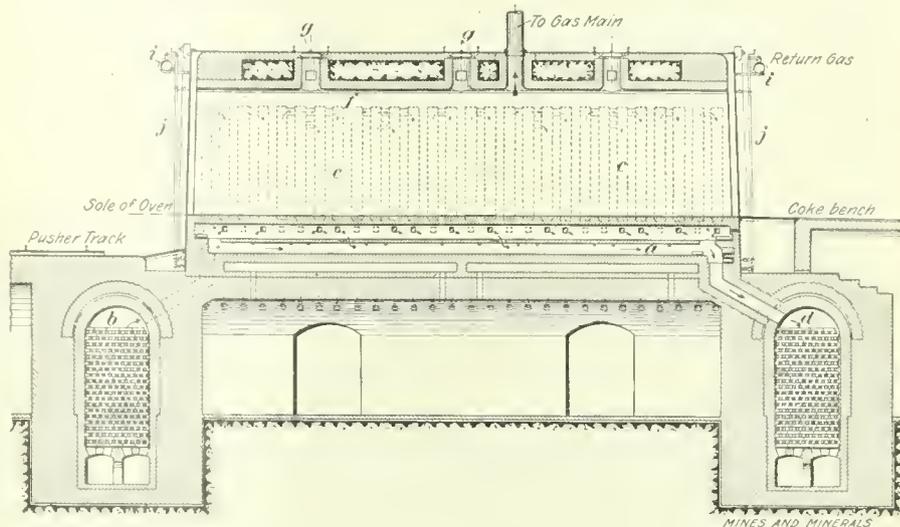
SECTION THROUGH THE OVEN CHAMBER
